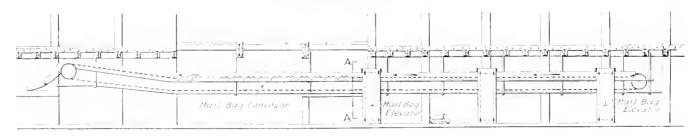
Defails of the Mail Bag Elevator and Arrangement of the Horizontal Bag Conveyor
